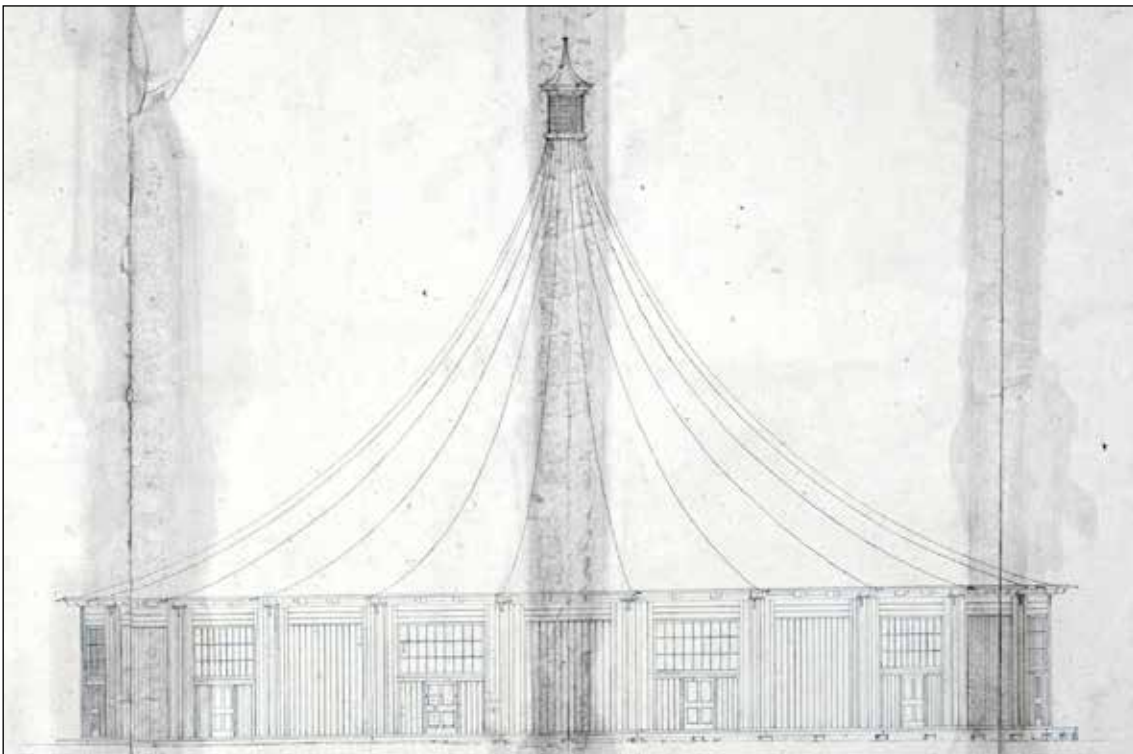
External elevation of Nash's 'tent room' at Carlton House, May 1814. The structure's walls appear to have been covered with decorative boarding and inset with twelve entrances. (The National Archives, ref. WORK 43/576; colour-adjusted)
